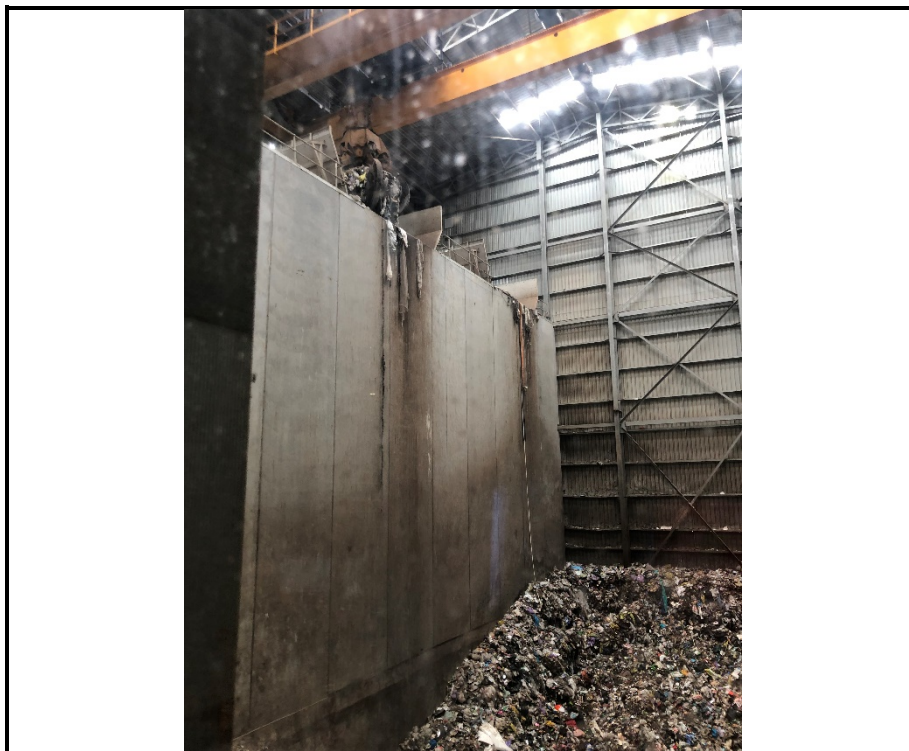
Inside the Reception building within the eastern portion of the site, looking towards the north.
